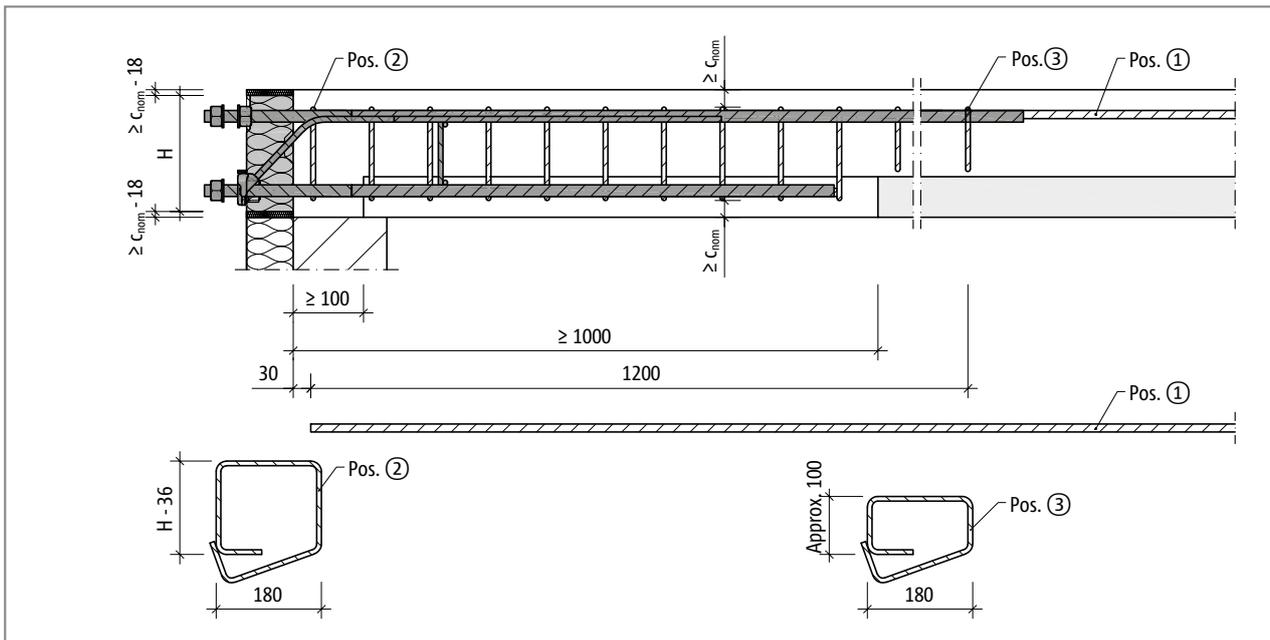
Schöck Isokorb® T type SK-MM2: On-site reinforcement with stirrup \varnothing 8 mm for semi-precaster construction; cross section
